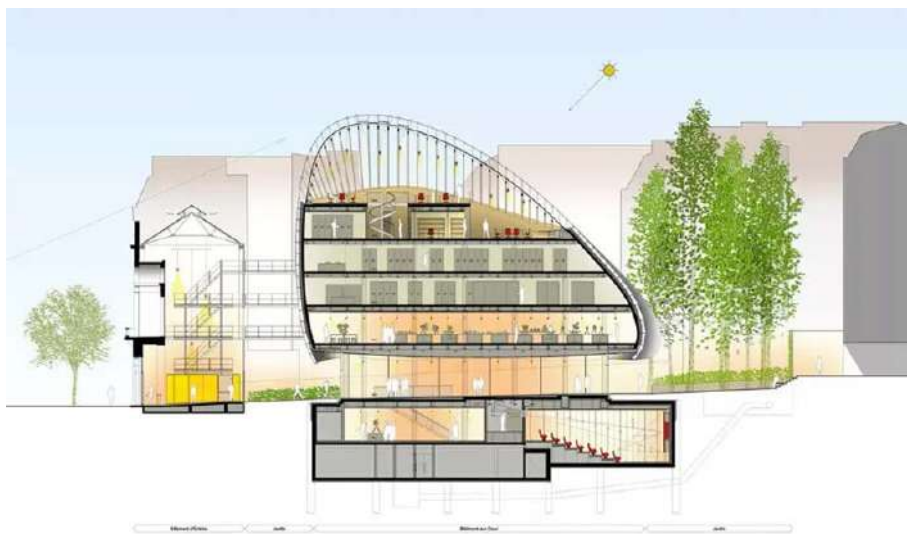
Pathe Foundation, Renzo Piano, Paris, France: Longitudinal vertical section (3)
